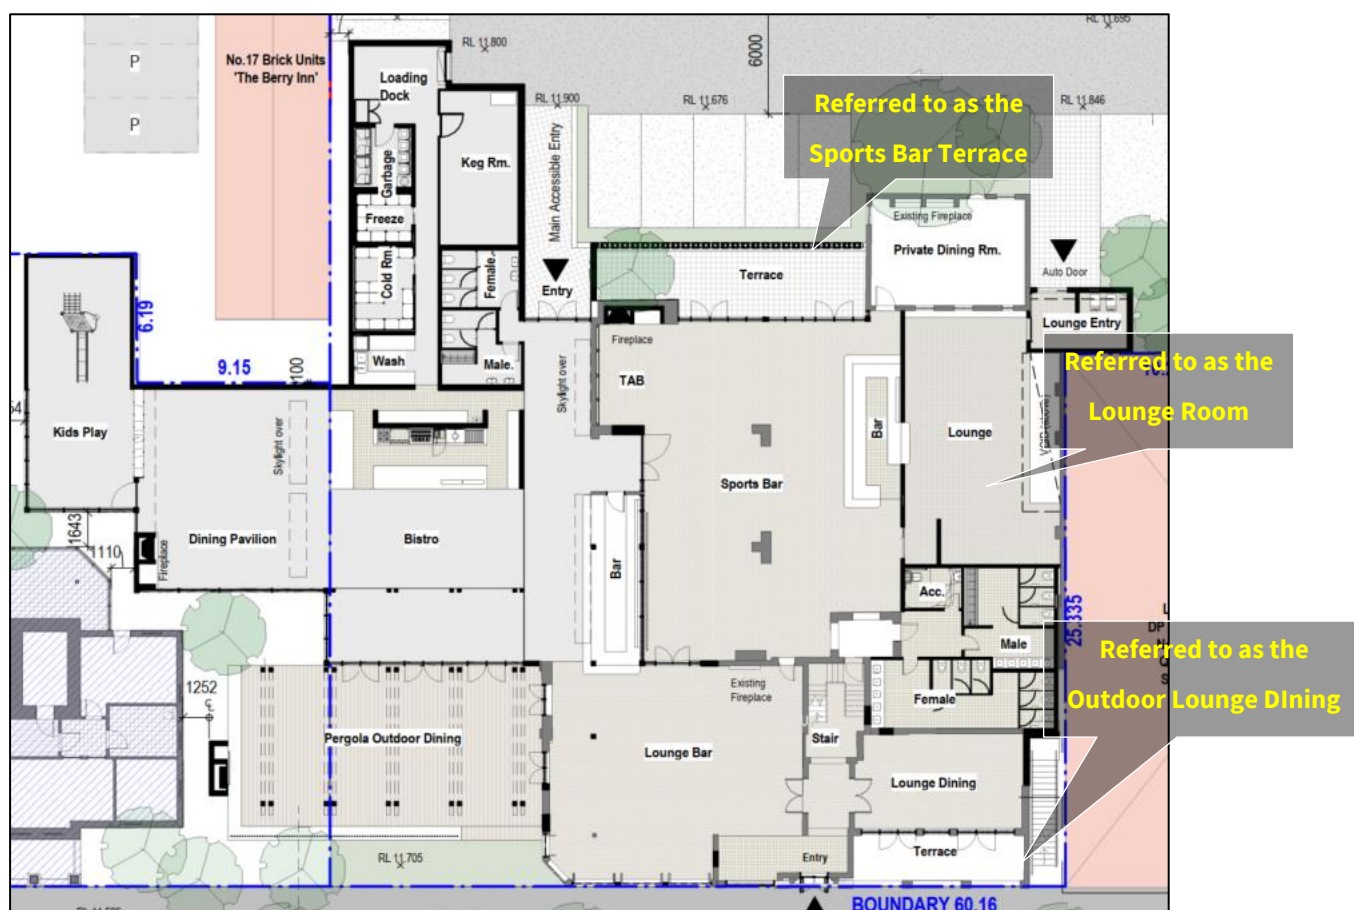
Hotel Ground Floor Plan – Image from H&E Architects
